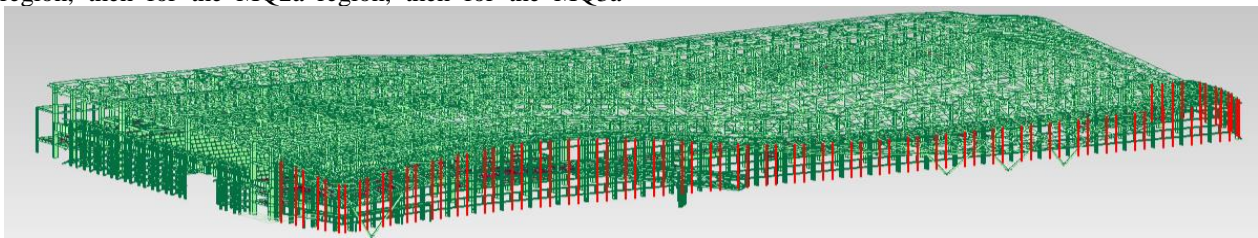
3D axonometric diagram of a exhibition Center's roof structure and cable curtain wall structure
